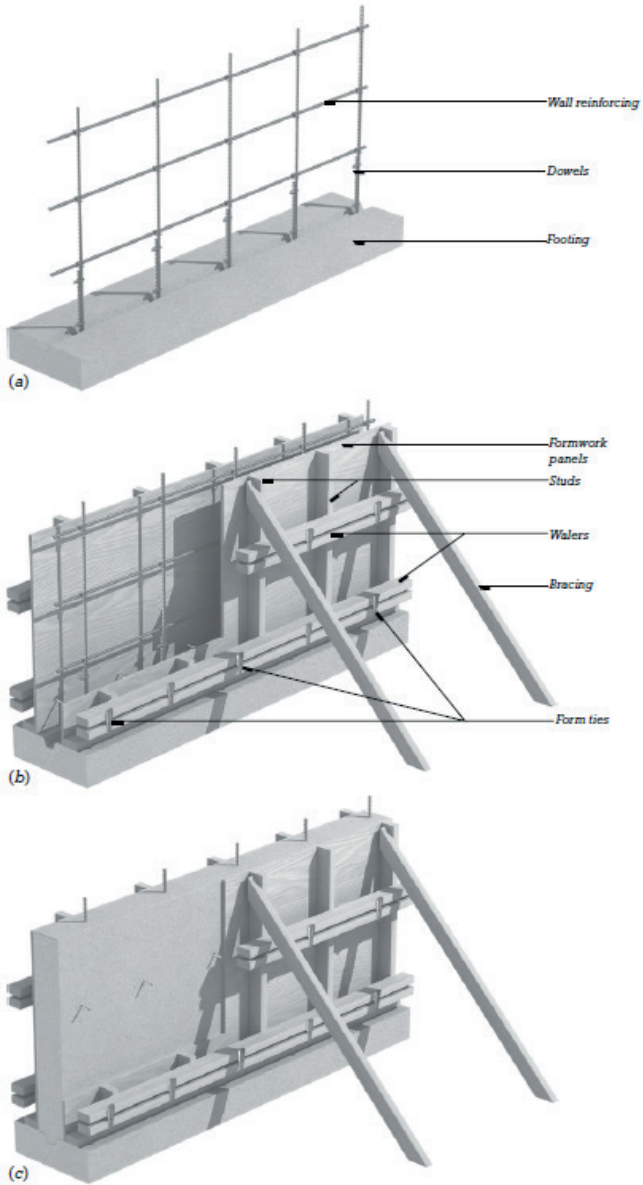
Reinforced Concrete Wall Construction (Allen & Iano, 2019, p. 540)
